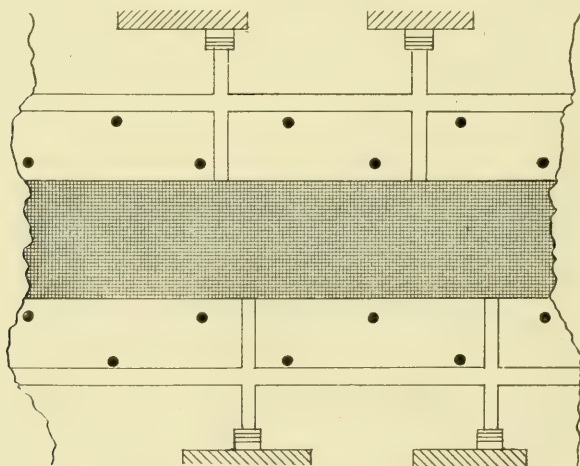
Plan of modern avenue provided with a 40-foot roadbed, 6-foot sidewalks, 23-foot tree belts, with alternating rows of trees 60 feet apart.
